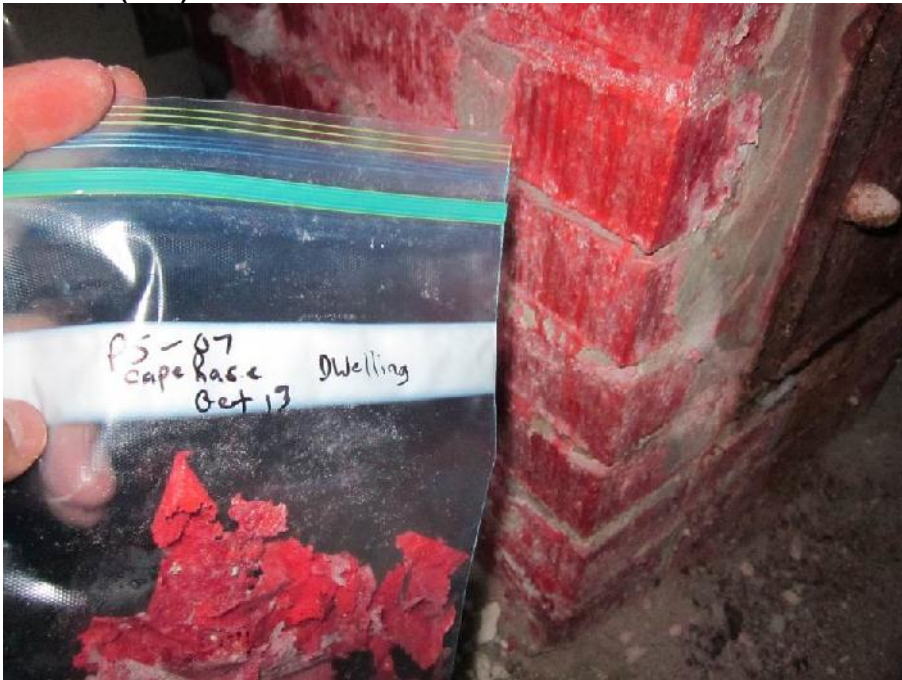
View of location of paint sample PS-07 in Room 11 (chimney).
